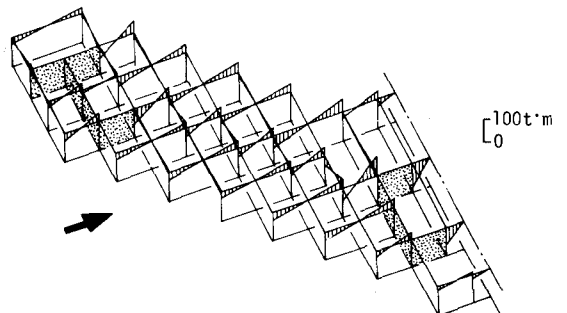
BENDING MOMENTS OF GIRDERS (20TH FLOOR)
